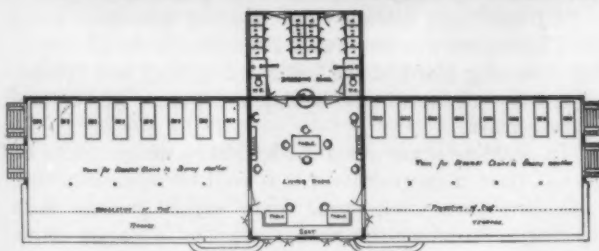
OTISVILLE SANATORIUM. ADMINISTRATION BUILDING FOR MEN'S UNIT. FIRST FLOOR PLAN
